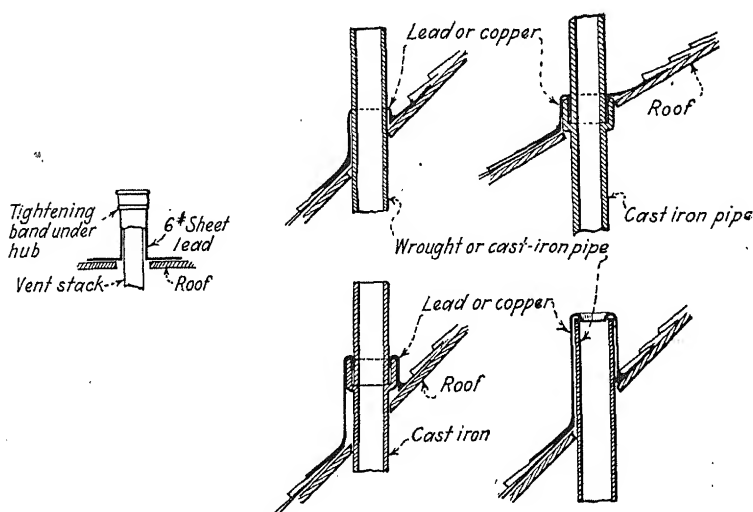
Illustrating the use of flashing around a soil or vent pipe passing through a roof. (From *Plumbers Trade Journal*, Apr. 15, 1925.)
